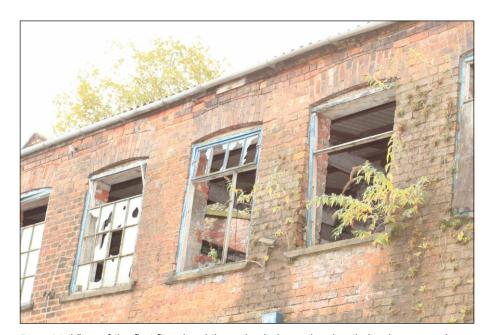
View of the first floor level through windows showing timber beams and modern roof structure, looking south-west (Film 2.11)
